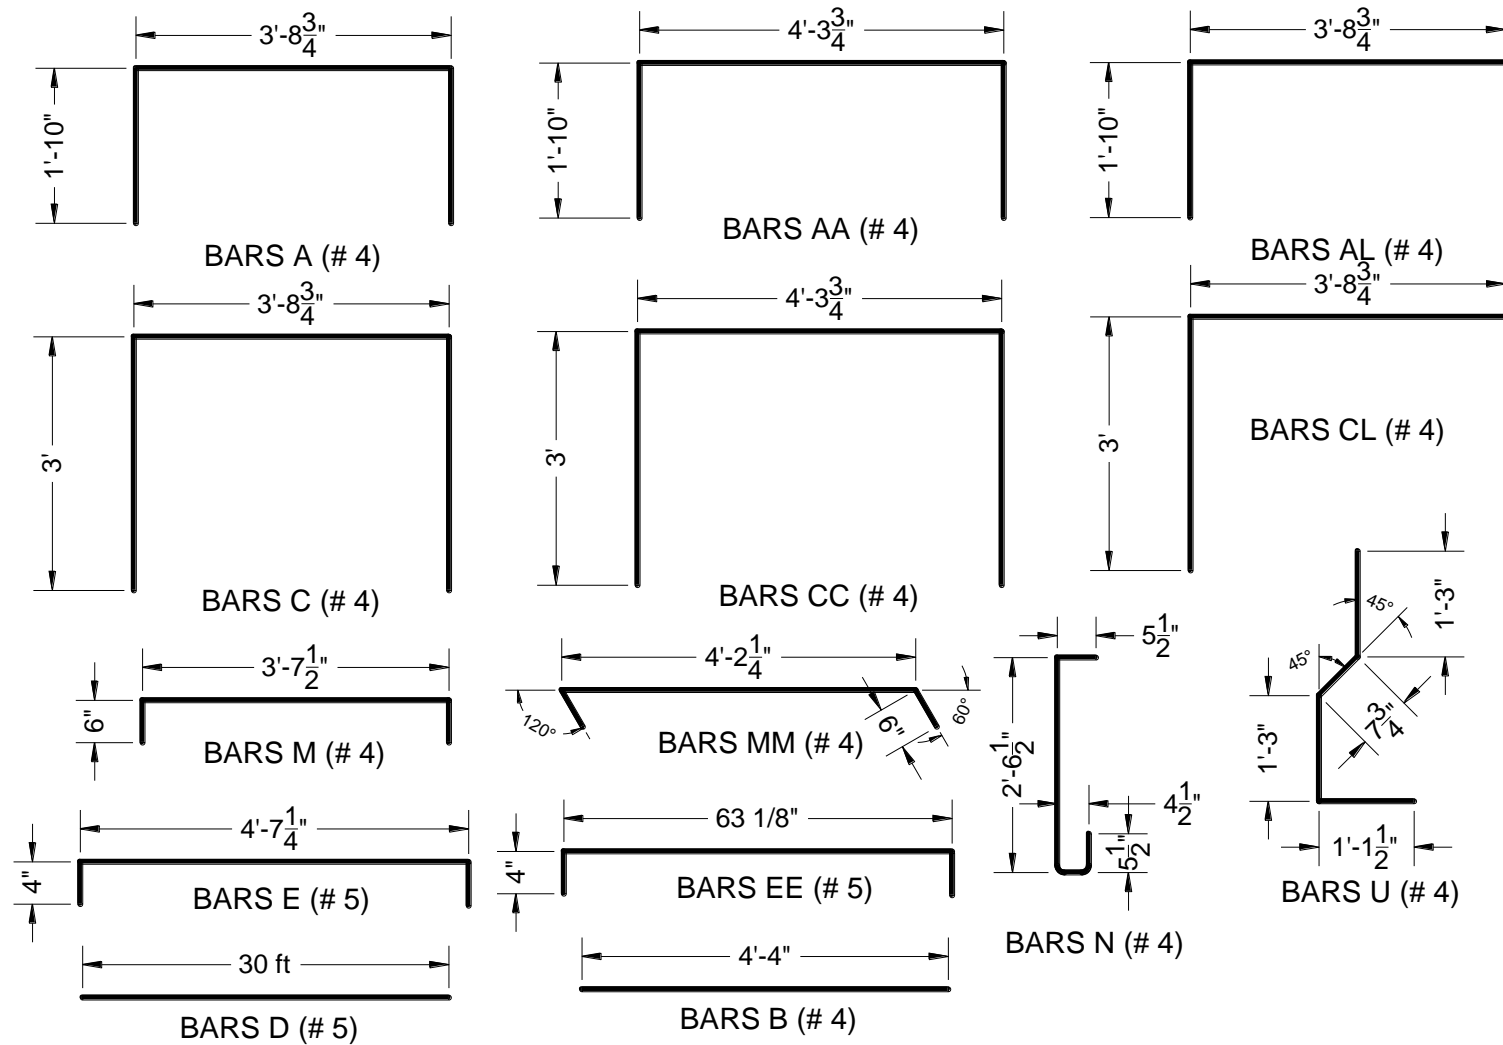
Reinforcement Bars. Beams 5B40-1, 5B40-2 and 5B40-3
